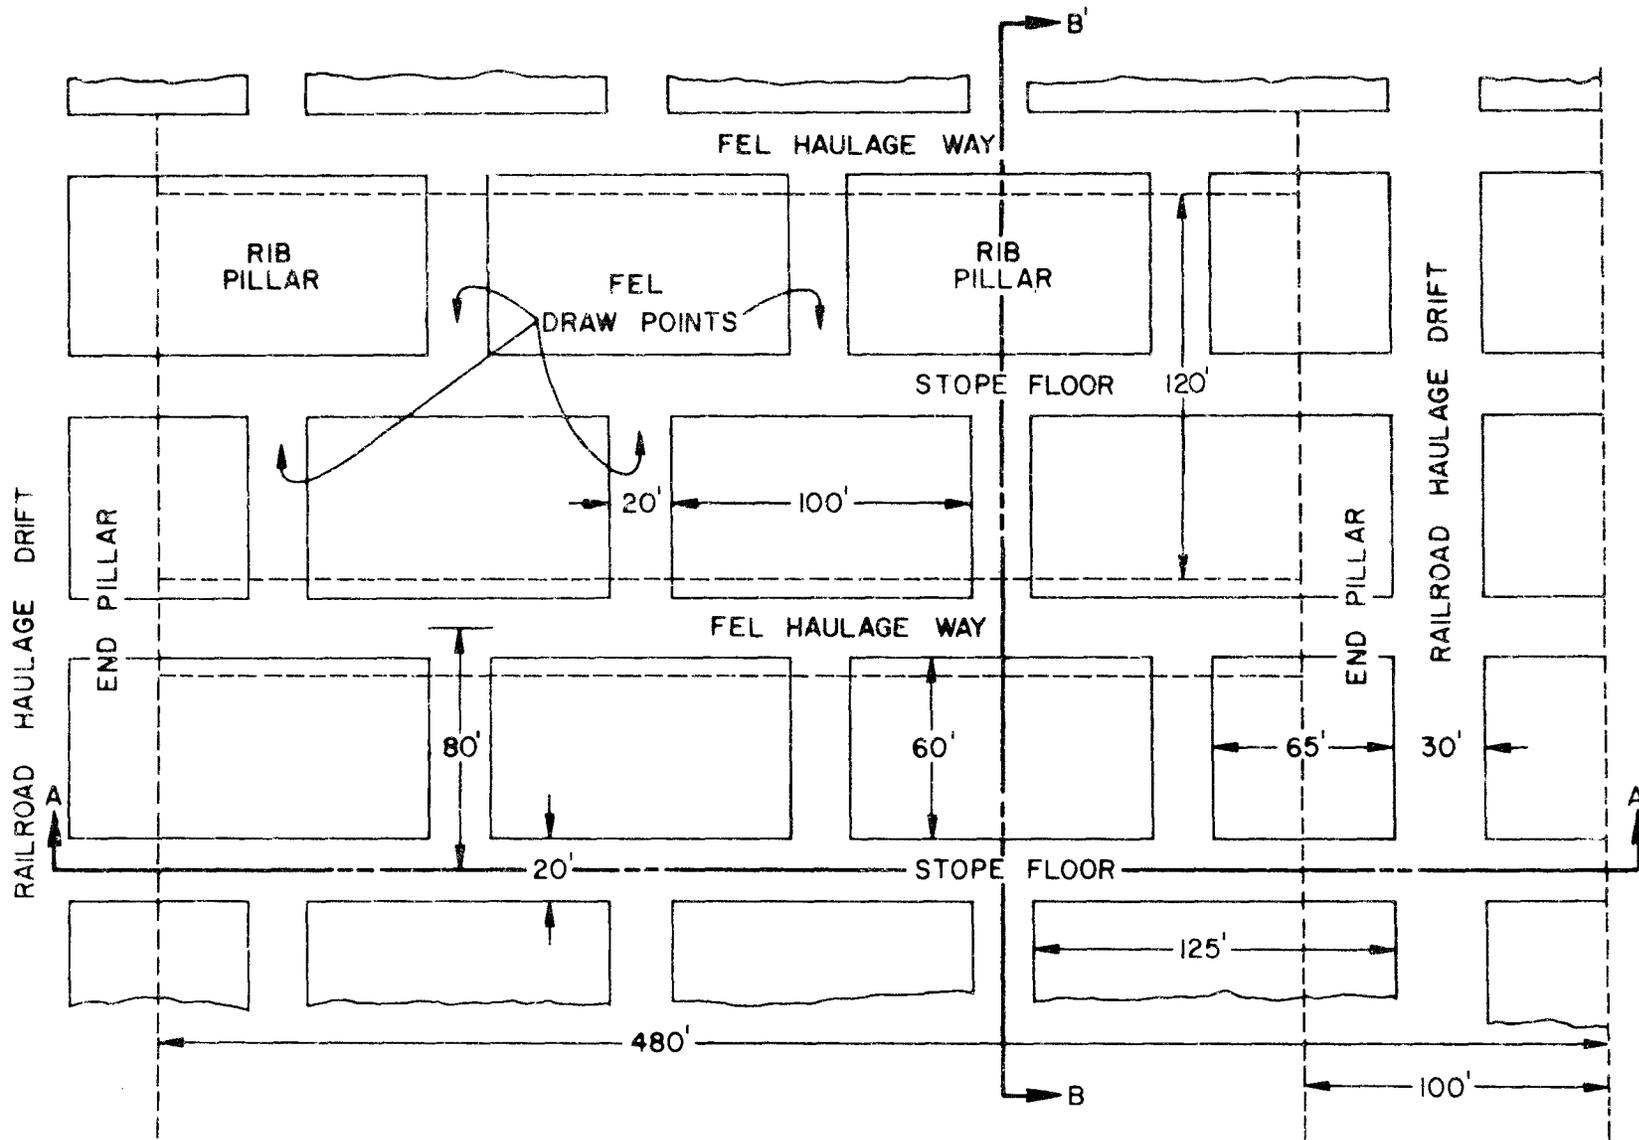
Plan View of Haulage Level, Sublevel Stoping with Spent Shale Backfill
